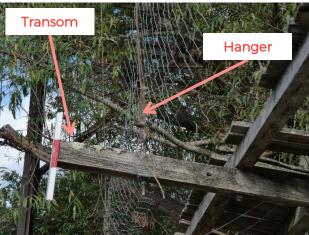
Typical hanger to transom connection with wire rope cable hanger
